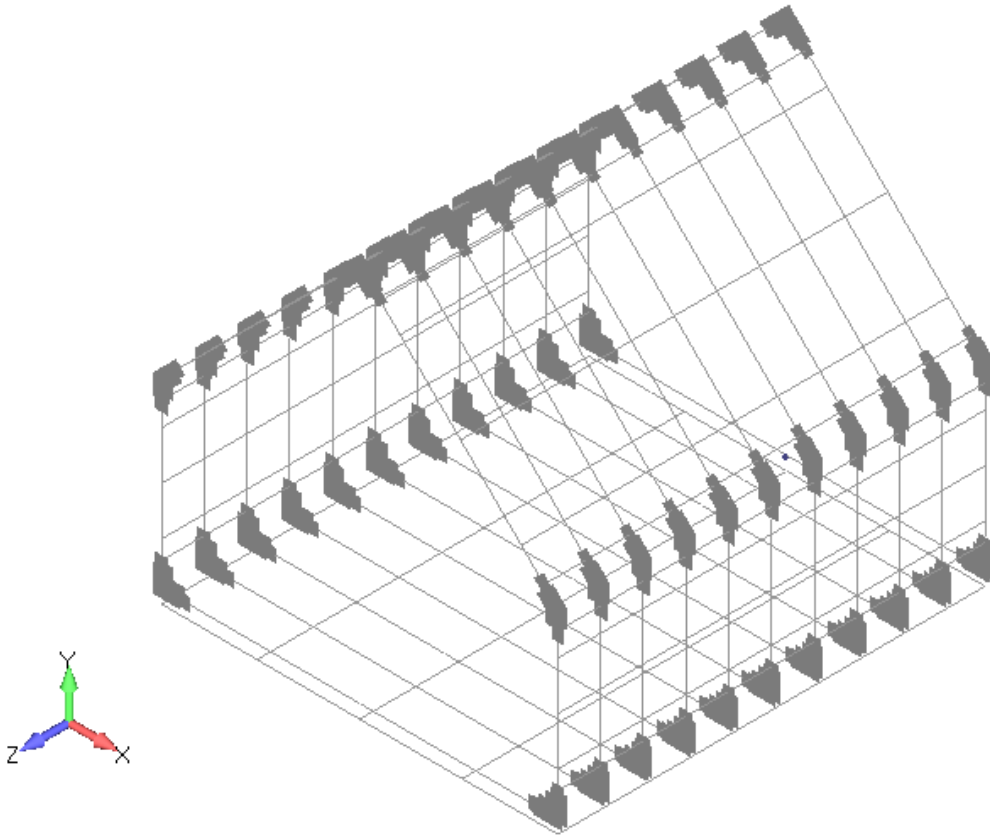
Finite element model of gable roof building with a roof pitch of 45 deg.
